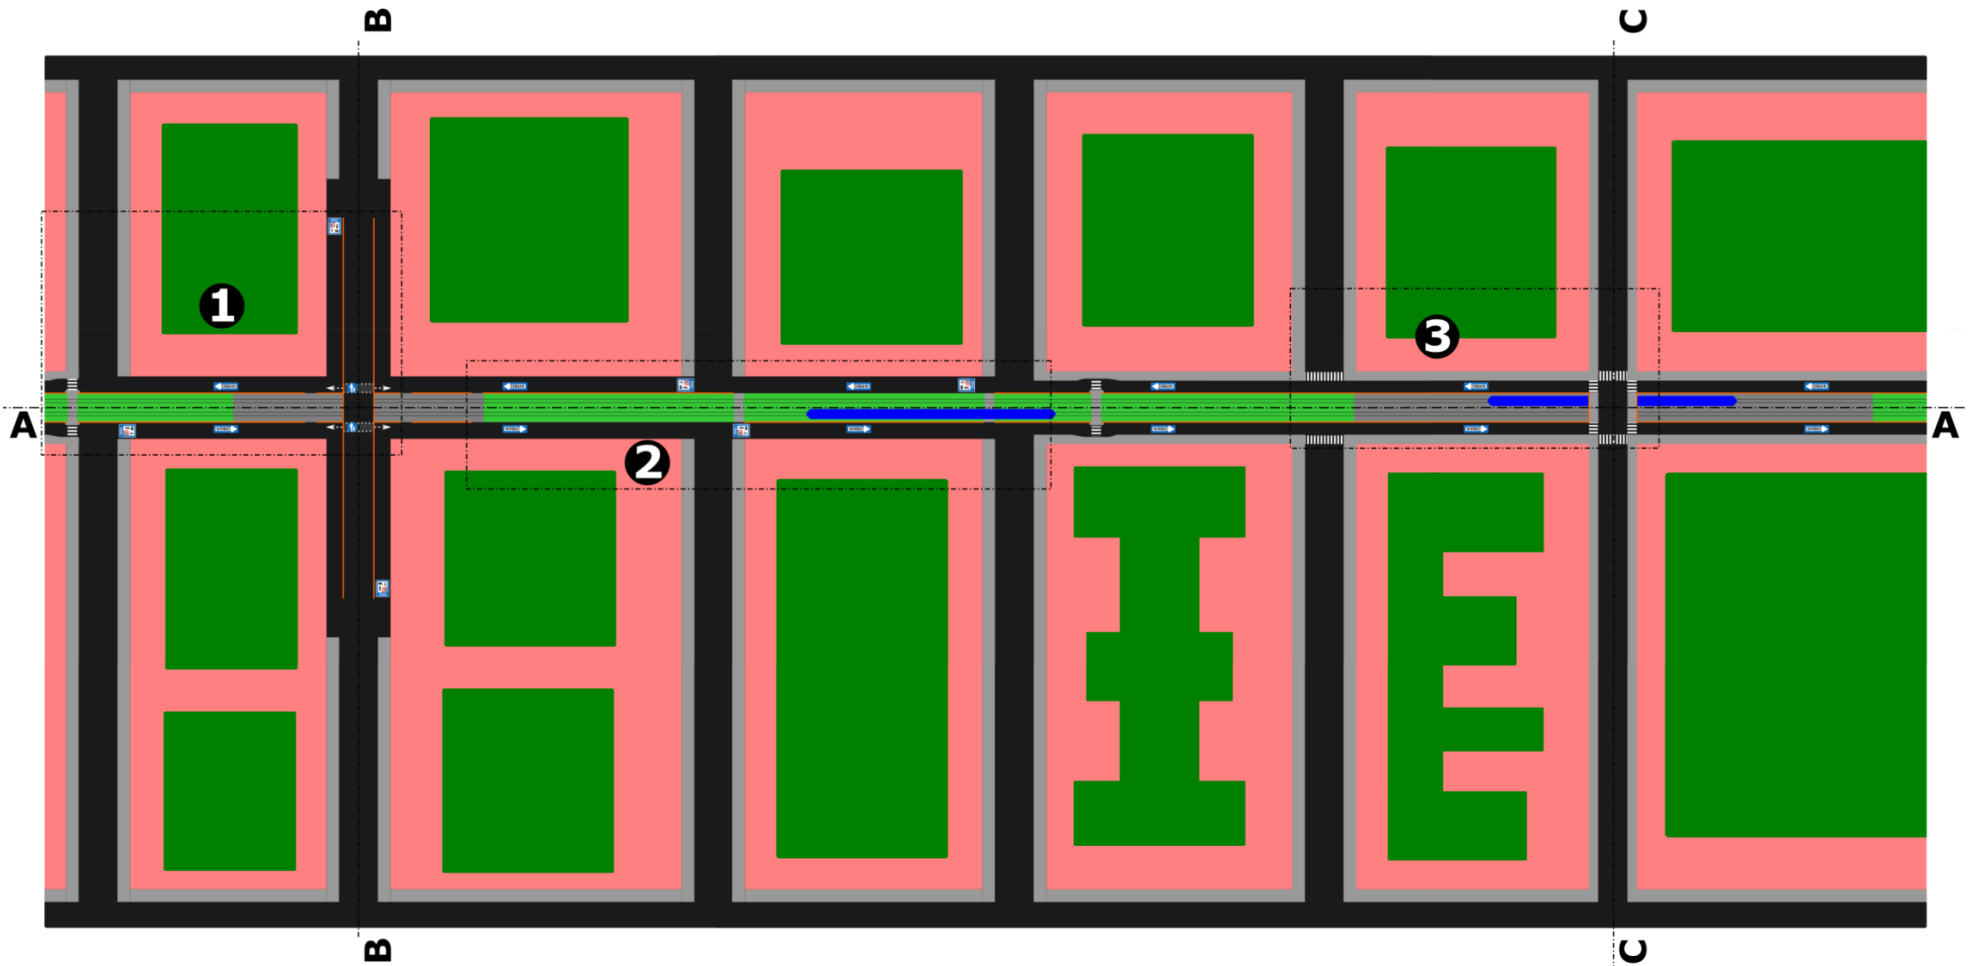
Ground plan of a section of an LCRT line with a shallow underpass (see also detail ❶, section B-B as well as the left part of section A-A), station area (see also detail ❷) and a deep underpass (see also detail ❸, section C-C and the right part of section A-A)
